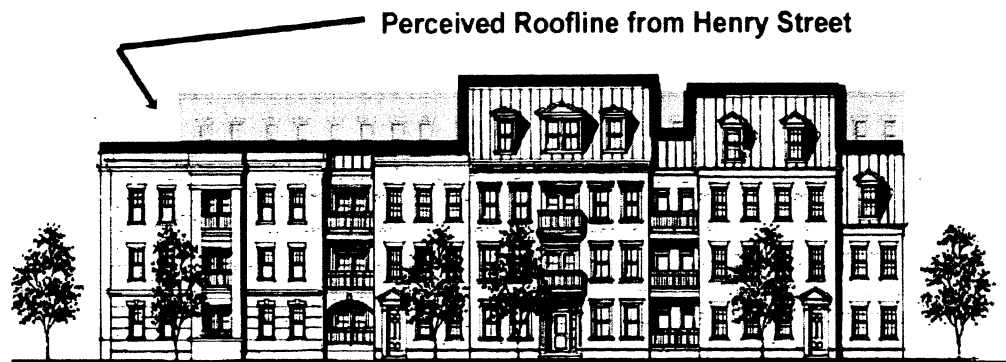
Applicant's Proposed Henry Street Elevation
